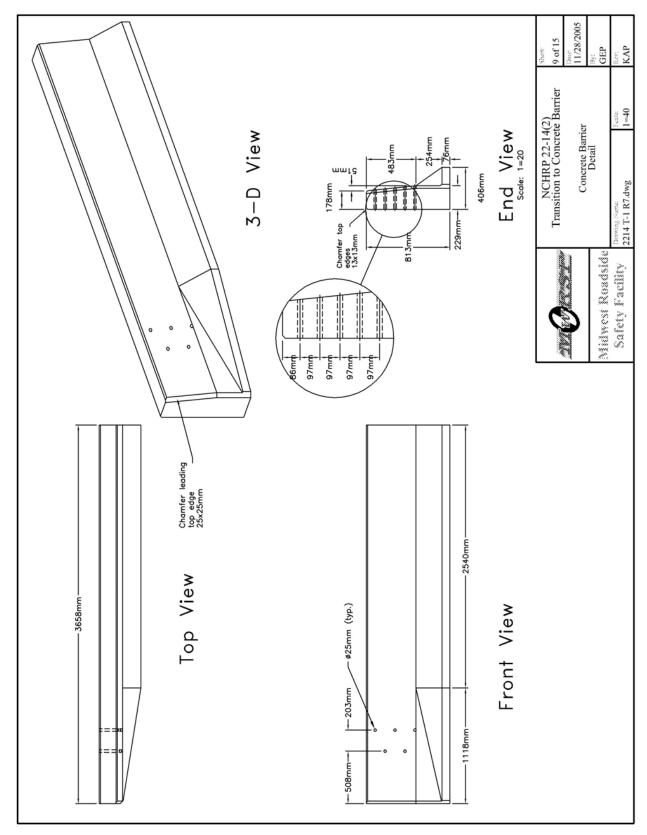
Approach Guardrail Transition to Concrete Barrier Design - Concrete Barrier Details
